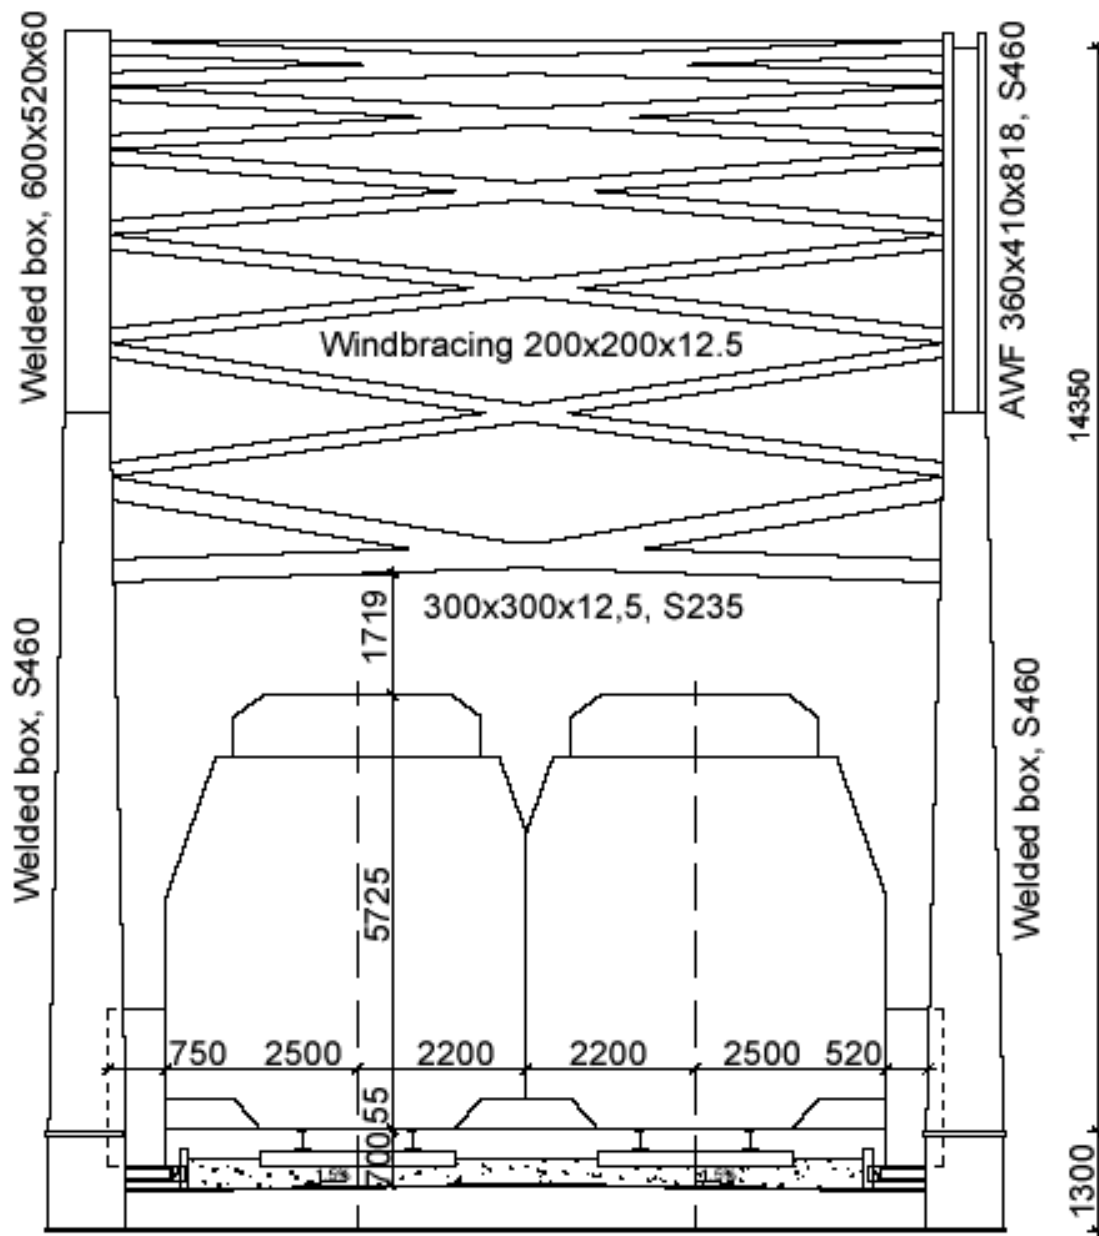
Front view with windbracing of steel alternative of Steimann's railway bridge
